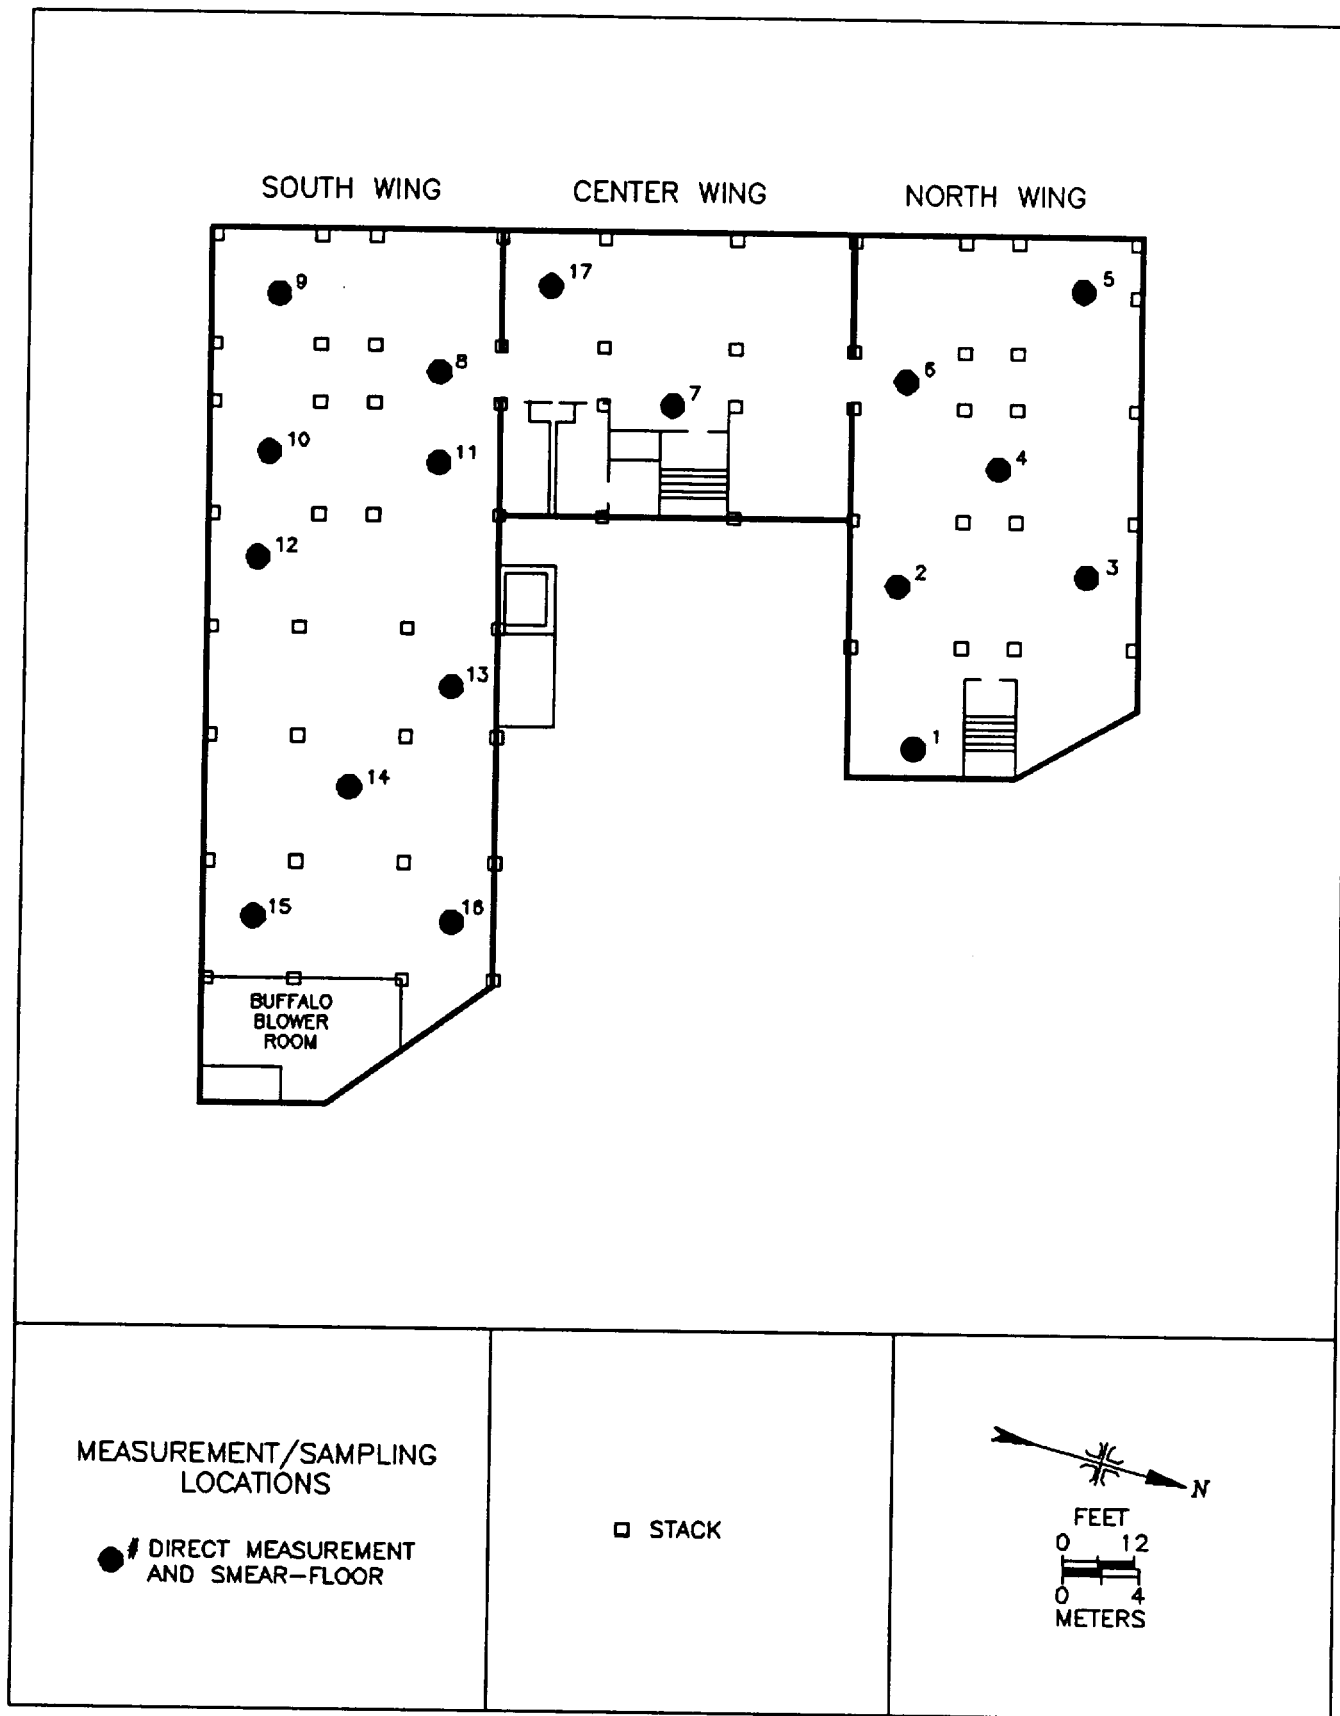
Building 7, Roof – Measurement and Sampling Locations
